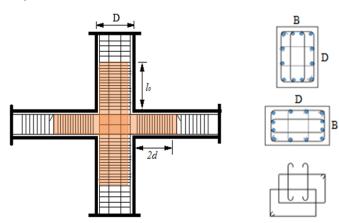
Typical column and joint detailing according to IS13920 (see online version for colours)
